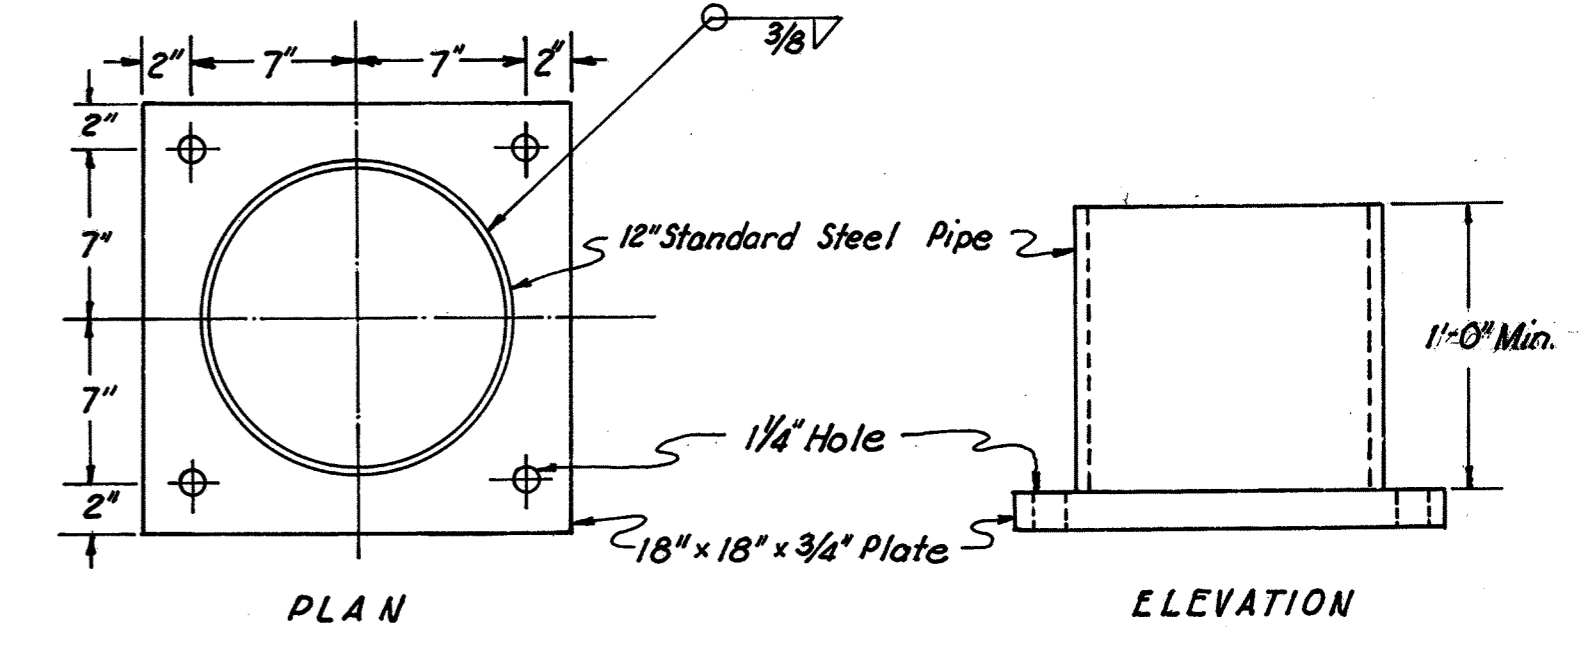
DETAIL SECTION SPRING DRAIN @ STA. 716+30
